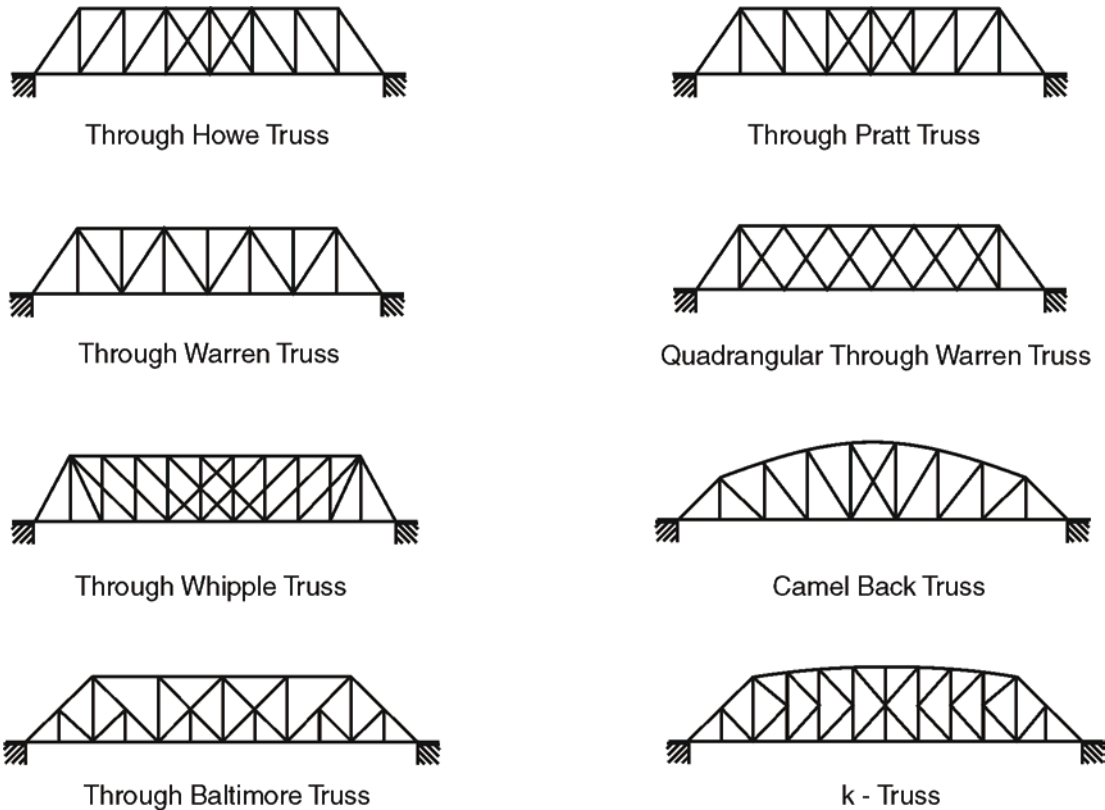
Examples of Simple Span Steel Truss Highway Bridges
